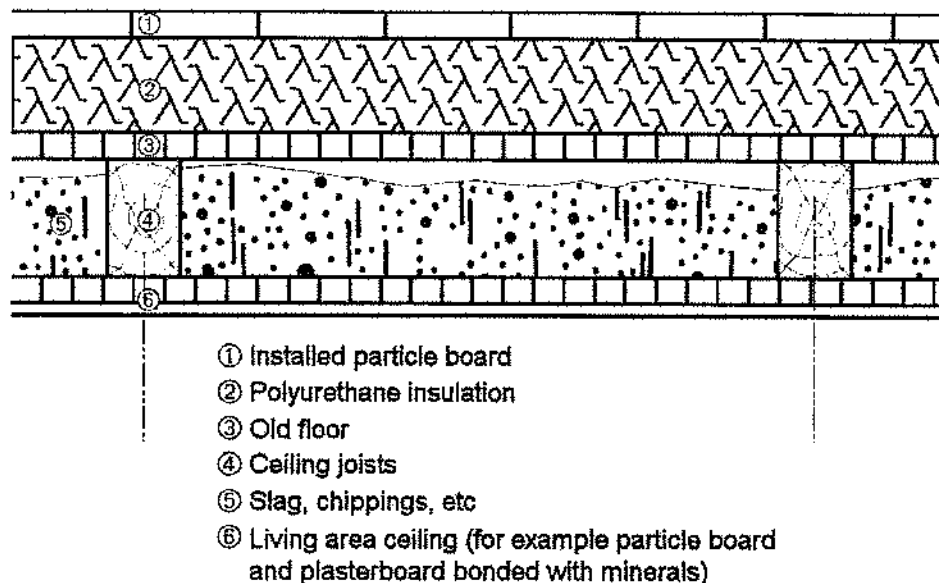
Retrofitted insulation of the top floor ceiling with polyurethane rigid foam
